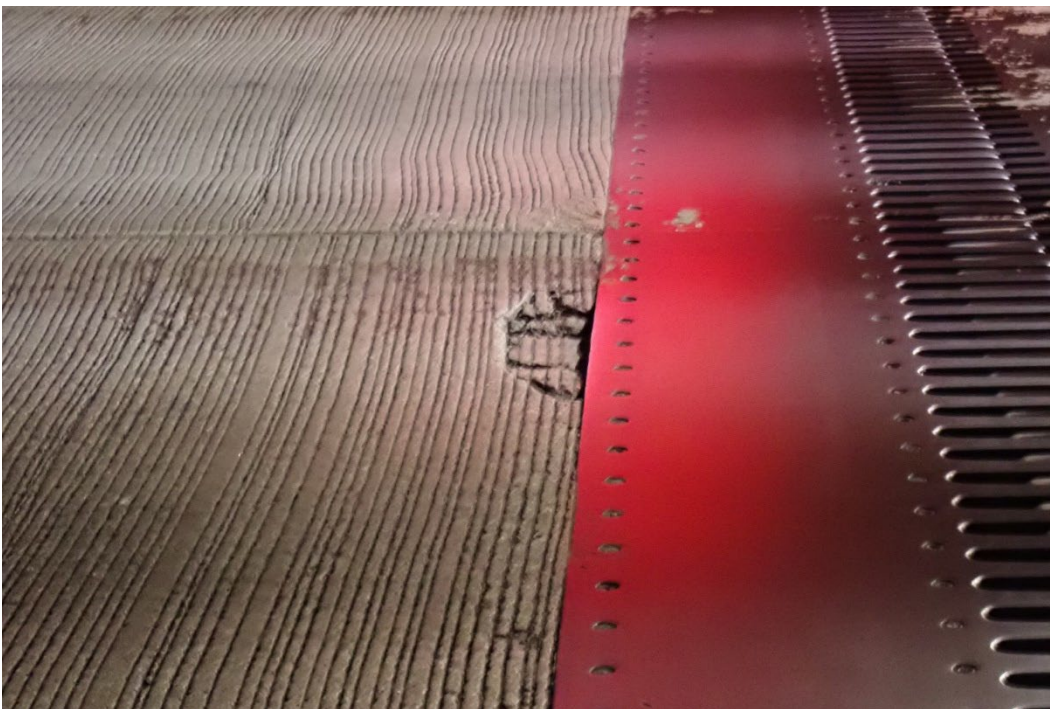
12" x 6" spall in wearing surface at joint with main span, at River Pier looking east.
